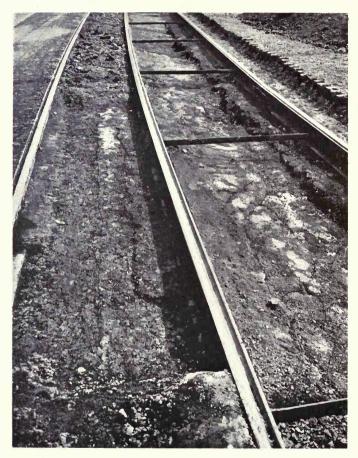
Showing Settlement of Fractured Concrete Foundations.
